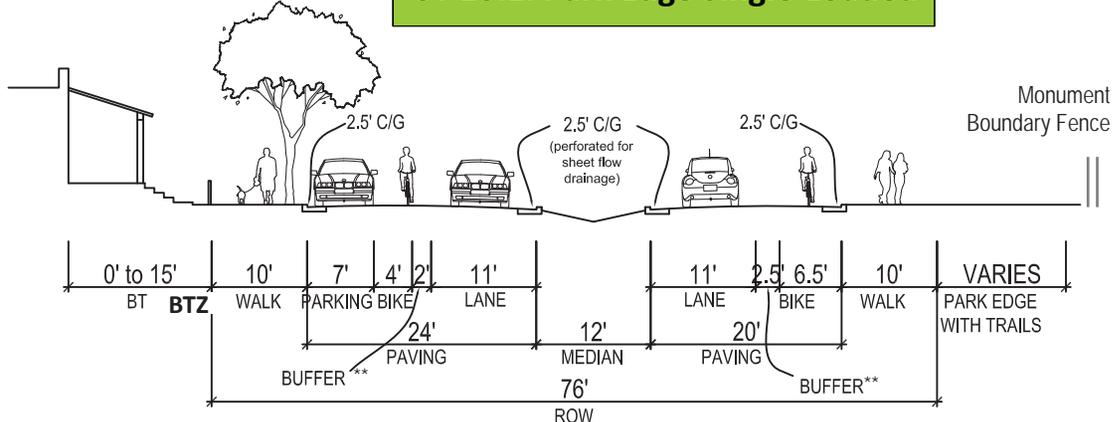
Street Type 10.1: Park Edge Single-Loaded
